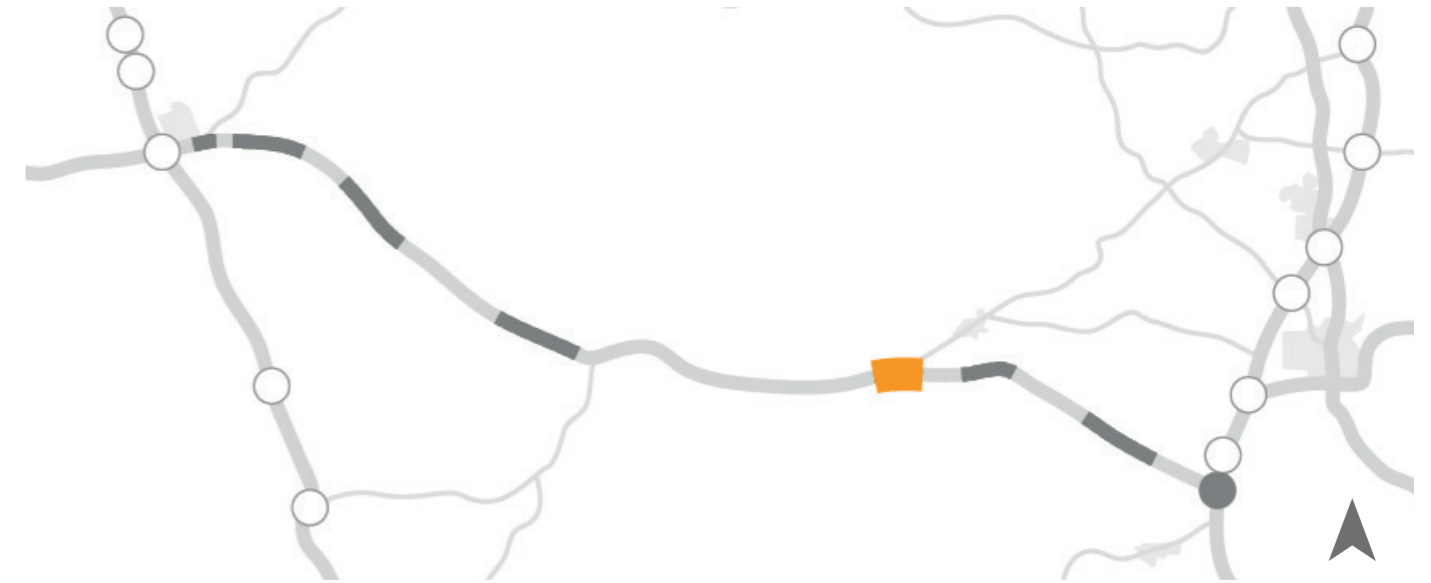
Key plan of Scheme 07 - Bowes Bypass
